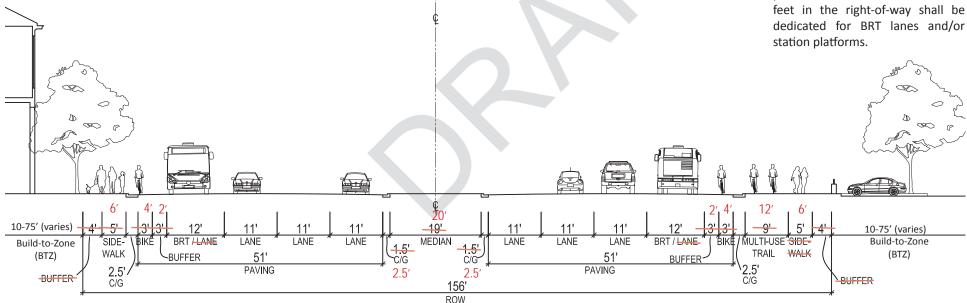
Street Type 7: Paseo del Norte Boulevard Cross Section [Update pending]
